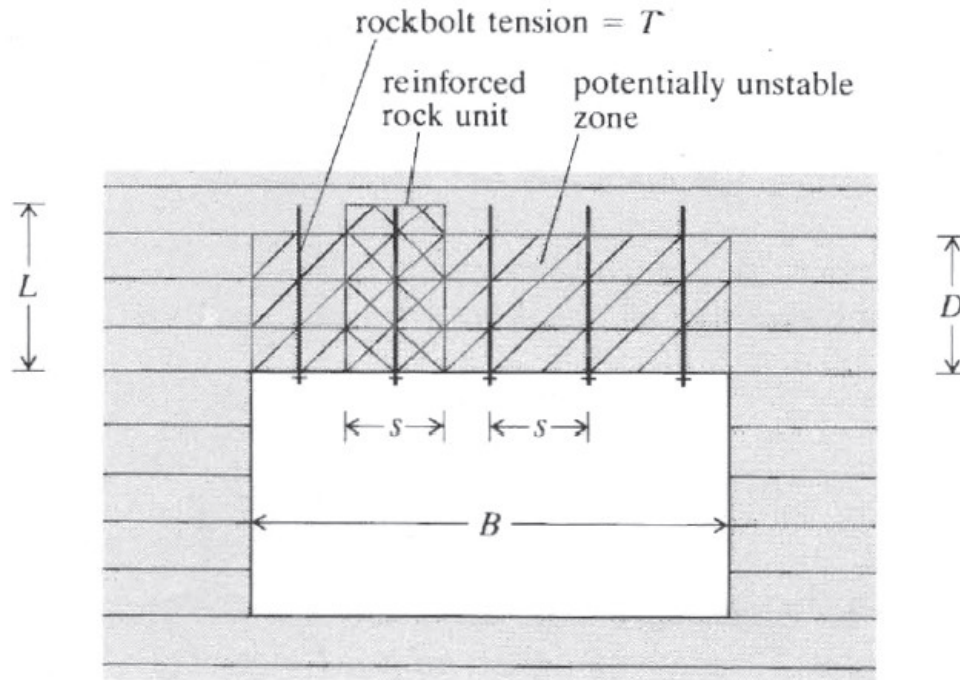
Rockbolt design to support the weight of a roof beam in laminated rock.
